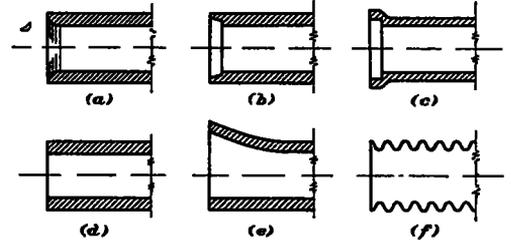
Types of Culvert Entrances. (a) Rounded-lip (concrete box). (b) Beveled-lip (concrete pipe), (c) Belled-lip (concrete or vitrified pipe), (d) Square-ended (concrete box), (e) Belled or Throated (concrete), (f) Affected Rounded-lip (corrugated metal).
